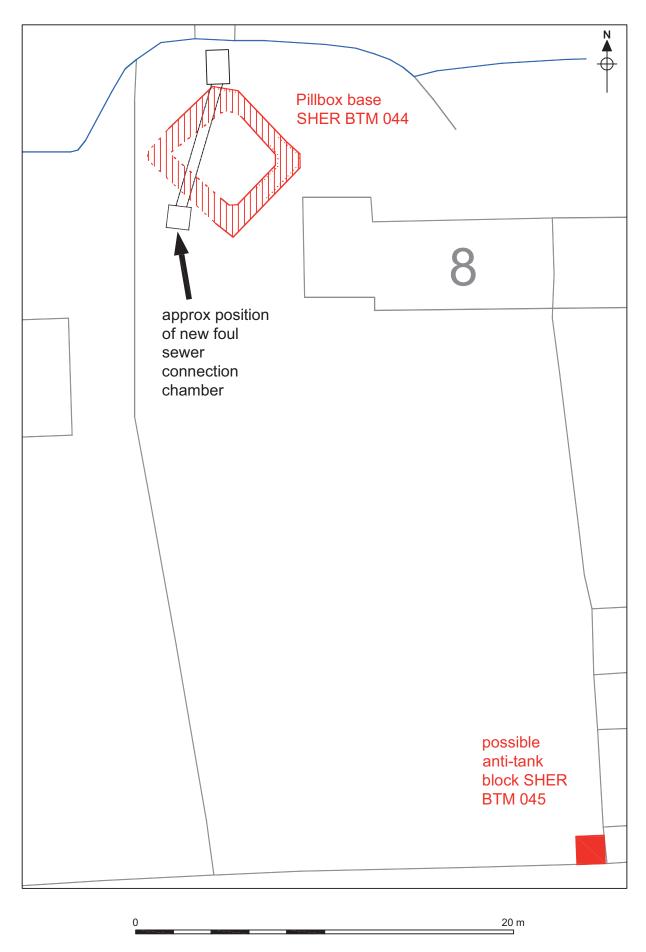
Plan of Pillbox base also shows location of possible anti-tank block. Scale 1:200.
